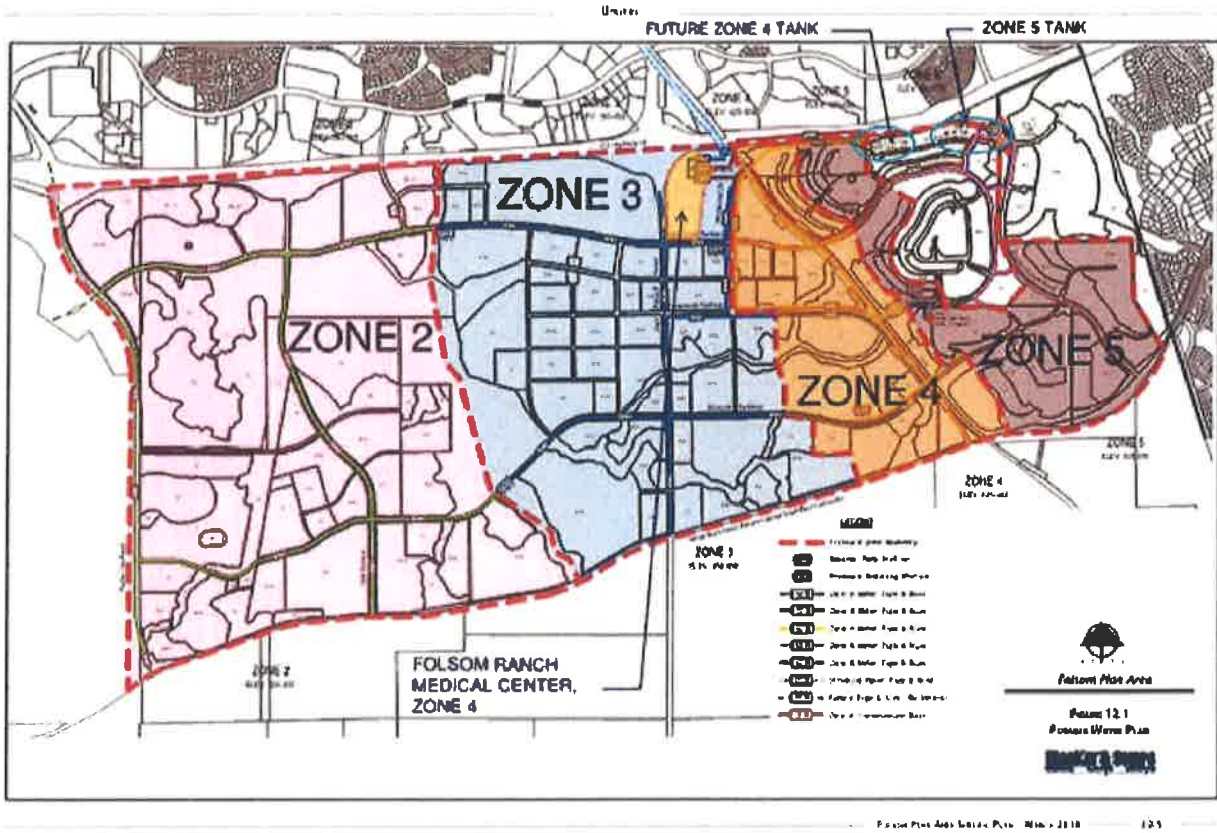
Exhibit E: Folsom Water Plan with Folsom Ranch Medical Center added to Zone 4
